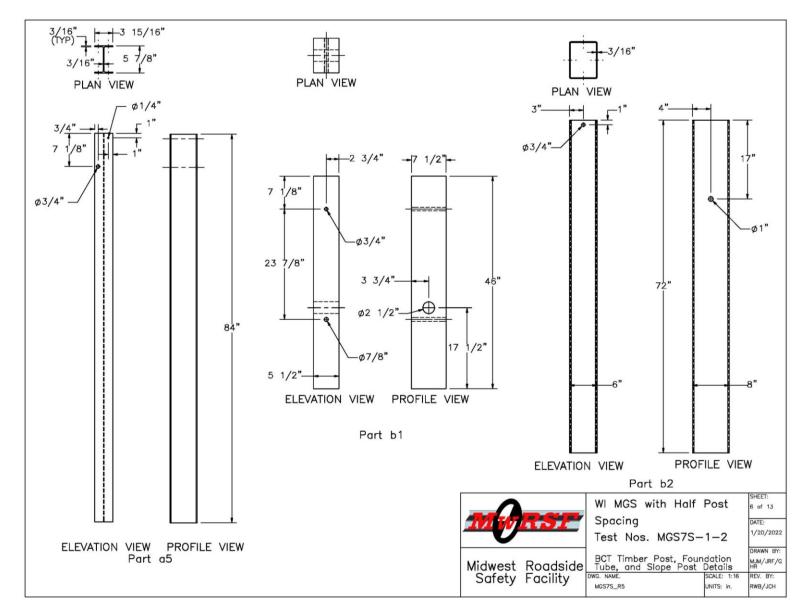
BCT Timber Post, Foundation Tube and Slope Post Details, Test Nos. MGS7S-1 and MGS7S-2
